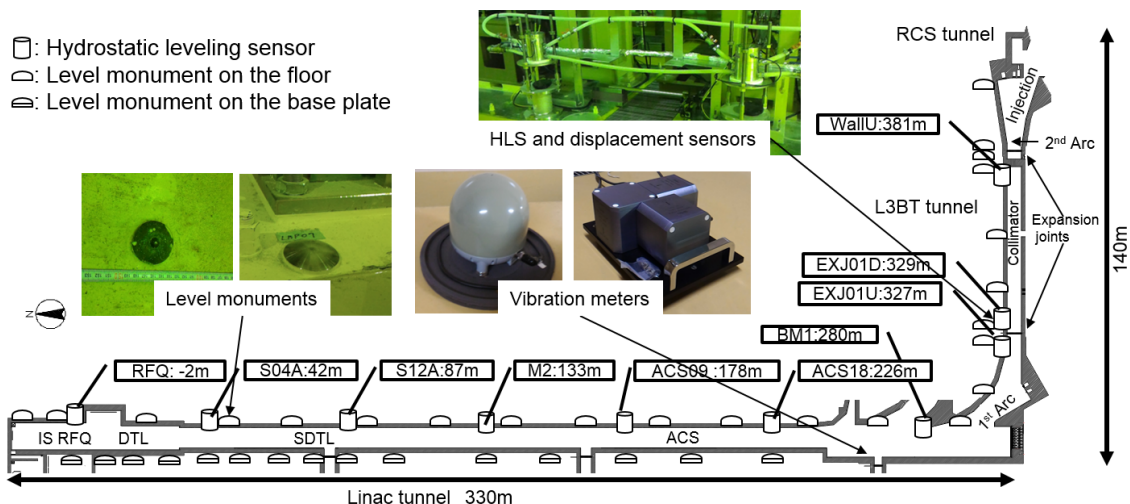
Layout of the J-PARC linac tunnel and instruments.
